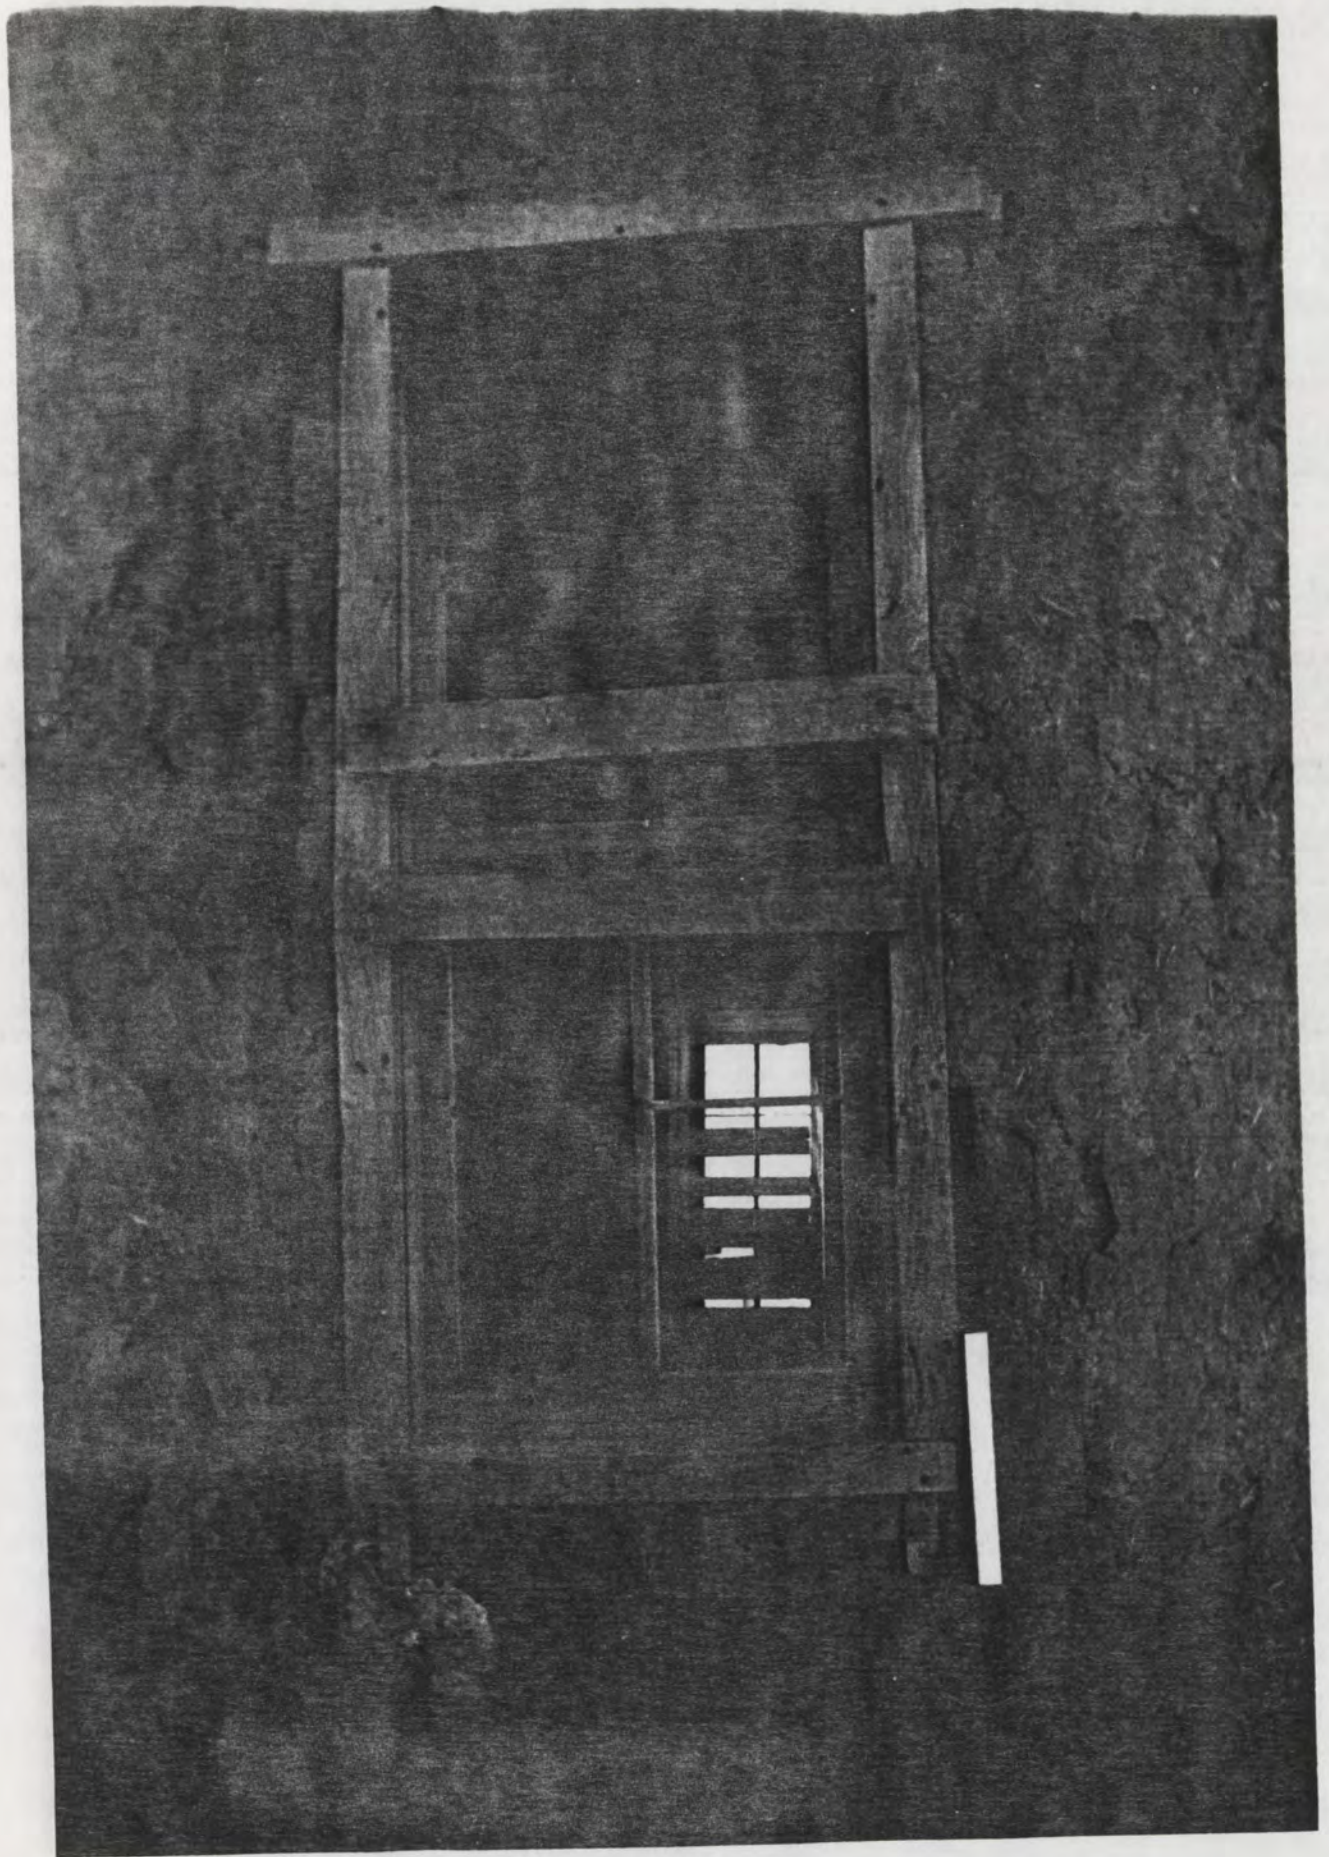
Wall Section Showing Points of Failure.
